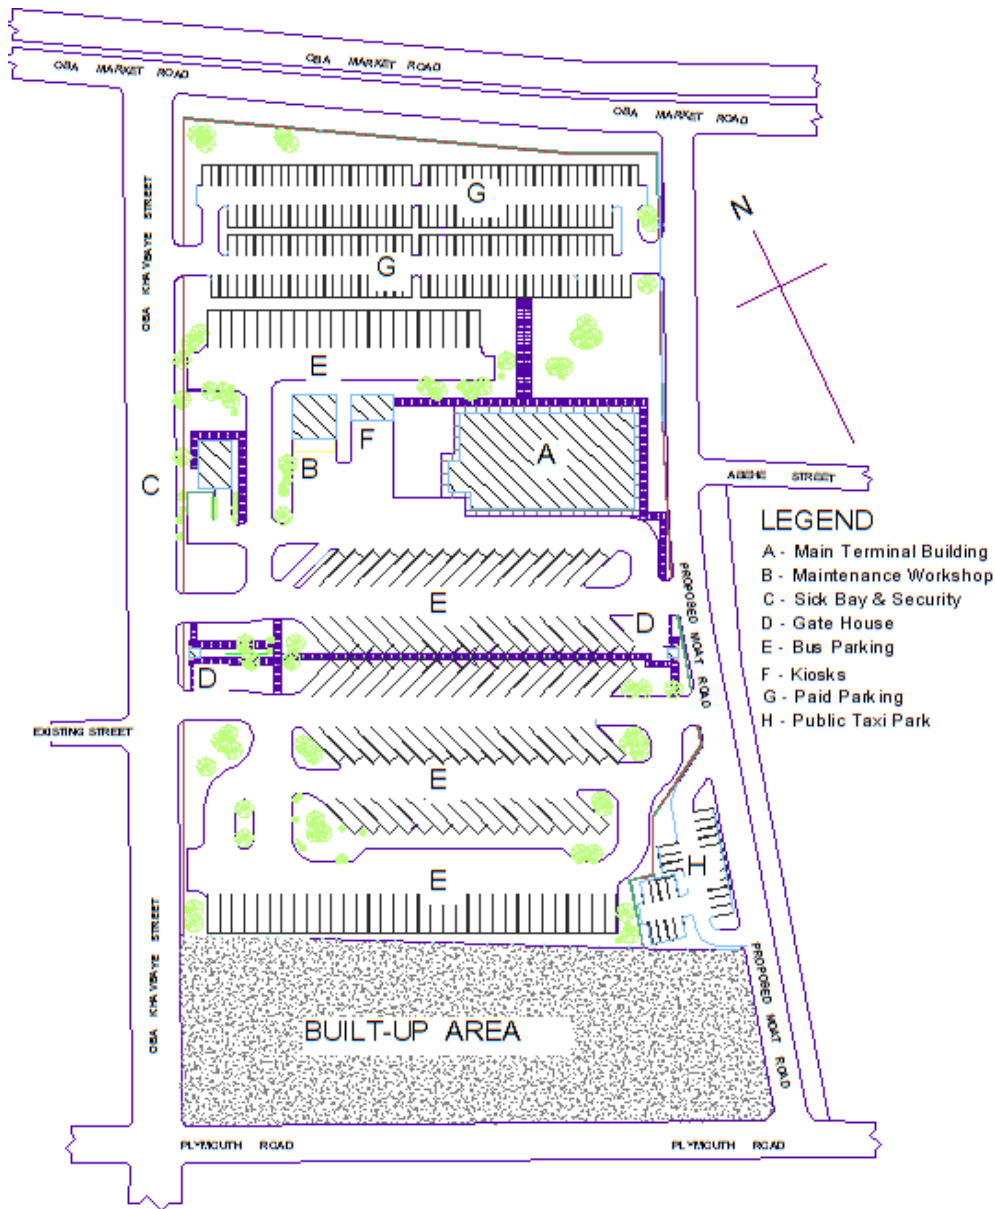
Size, perimeter, shape and orientation of the consultant site plan
